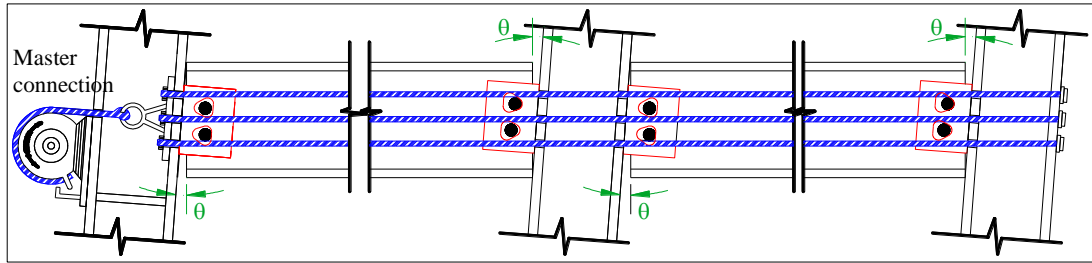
Arrangement of the master connection and other connections in one storey.
